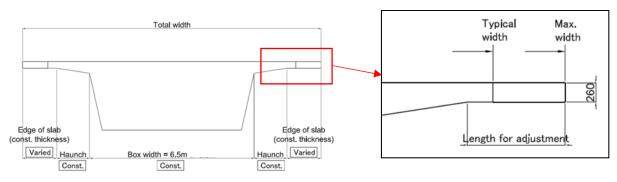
Bridge Layout and Box Width of the Girder (A1~P10)
